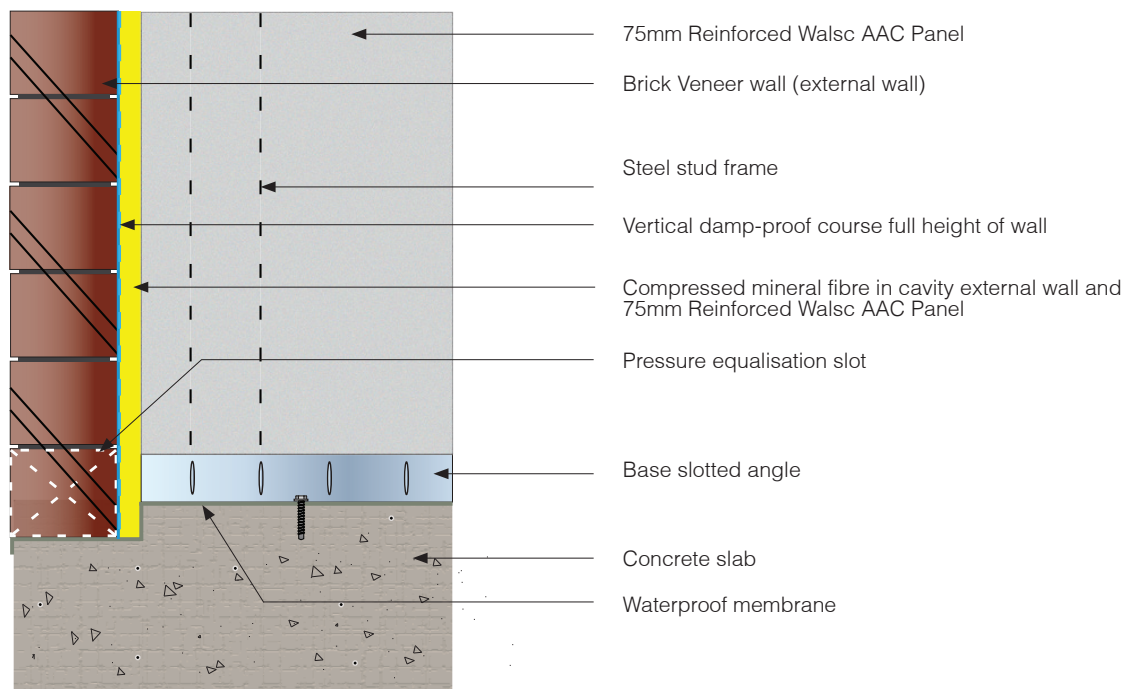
Inter-Tenancy / Corridor Wall to Brick Veneer Junction Detail - Section BB
